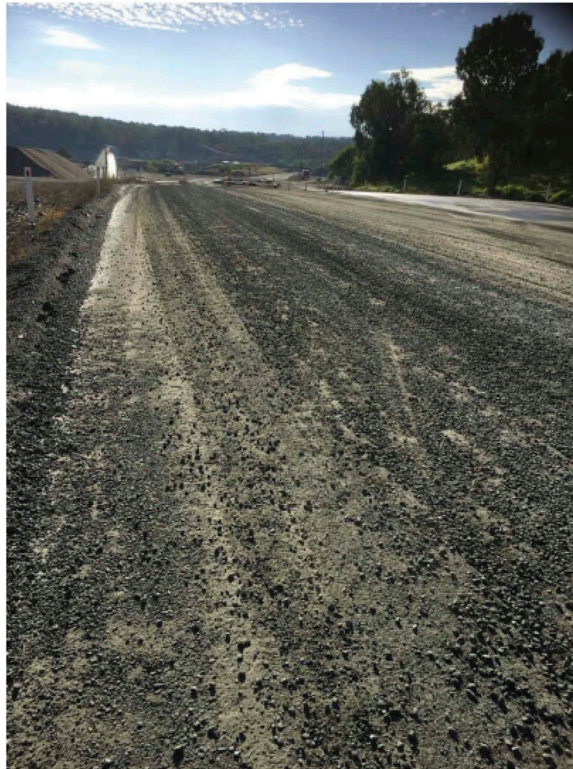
Treated section of road pavement facing North West in July 2018 showing no visible defects. Pavement is 10 m wide (Callanan, 2018).
